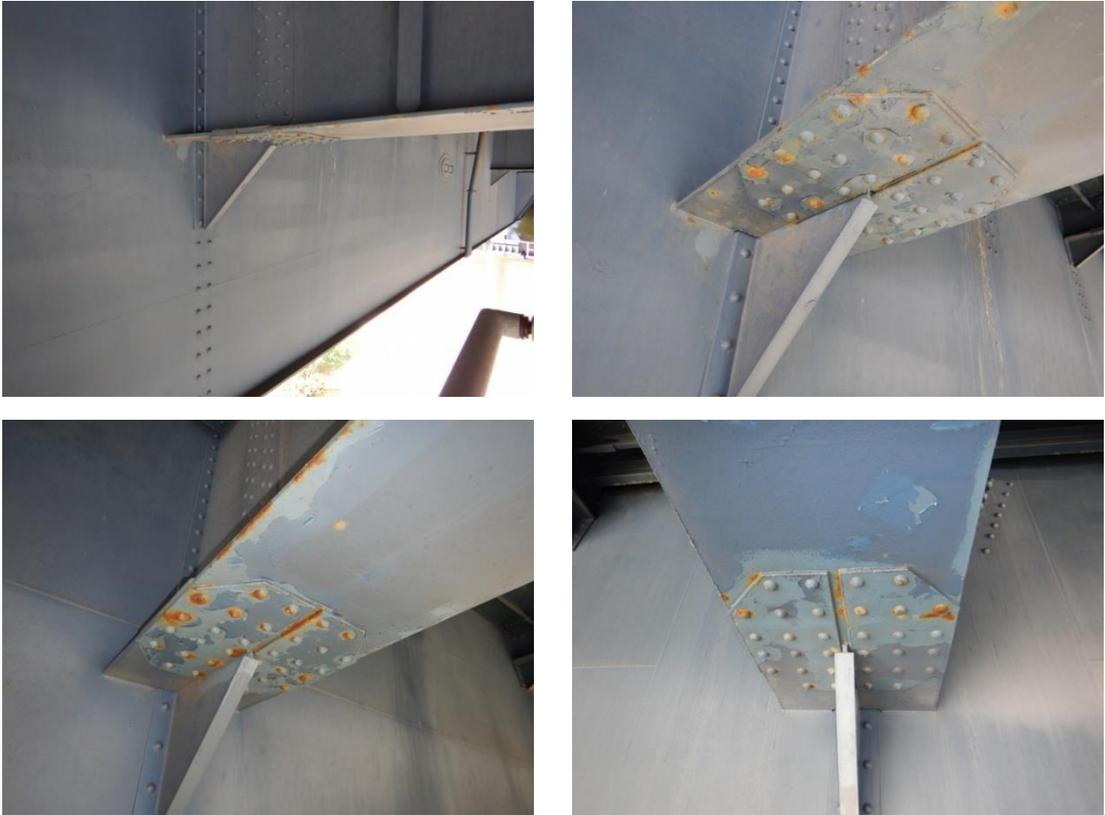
Corrosion on bottom flange of primary crossbeam at connection to main girder,
